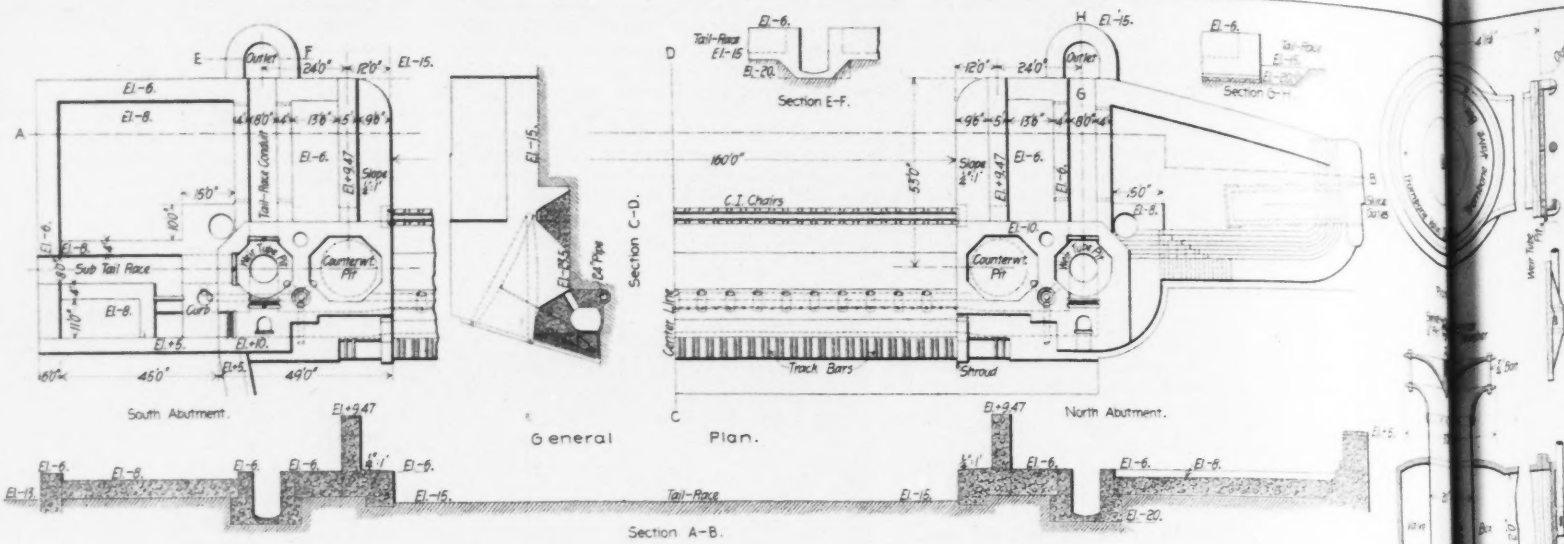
GENERAL PLAN AND SECTIONS OF BEAR TRAP FOUNDATIONS.
